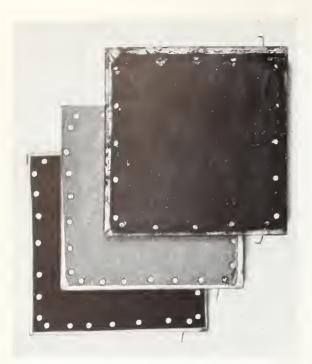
Shrinkage of sheathing papers after cyclic wetting and drying.
